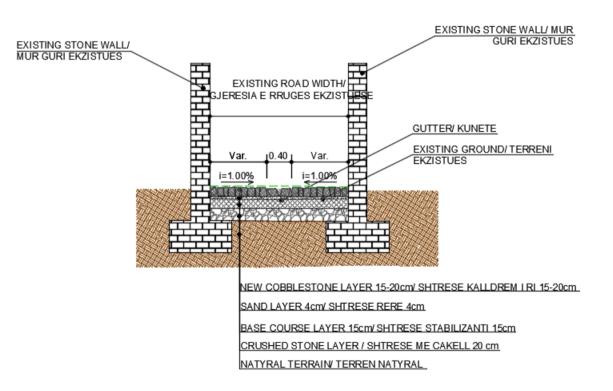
Typical Cross Section (Type 3 – Full Road Layers)
